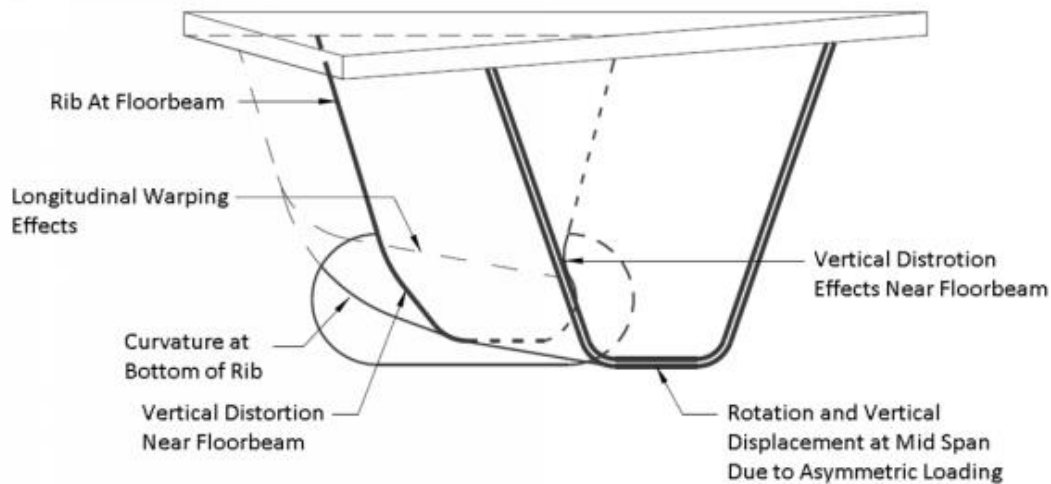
Rib distortion in the rib-to-floor beam intersection with cut-out
